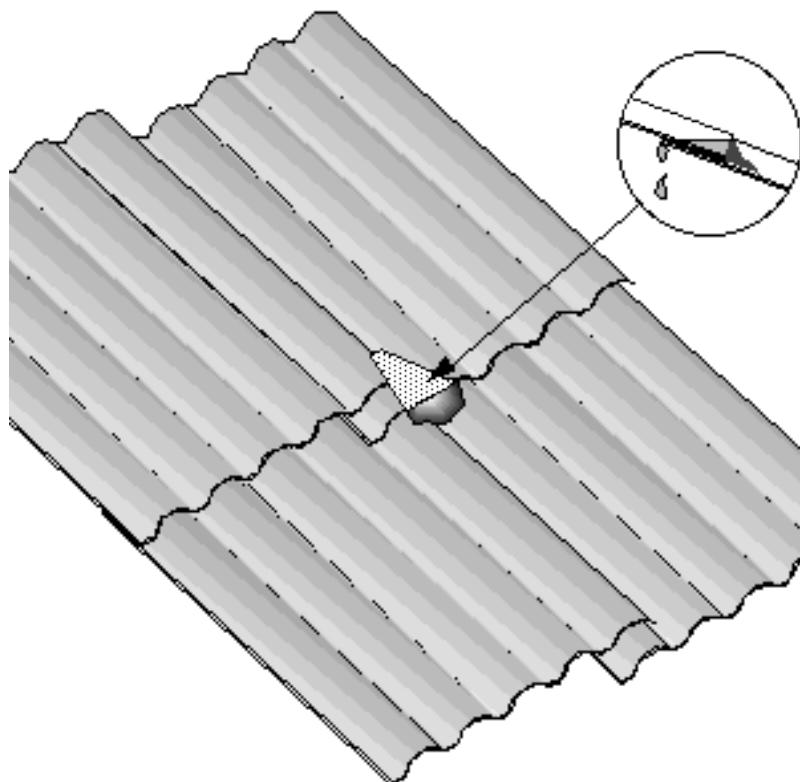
Detritus can build up in valleys of sheeting and lead to water penetrating to the interior of the building
